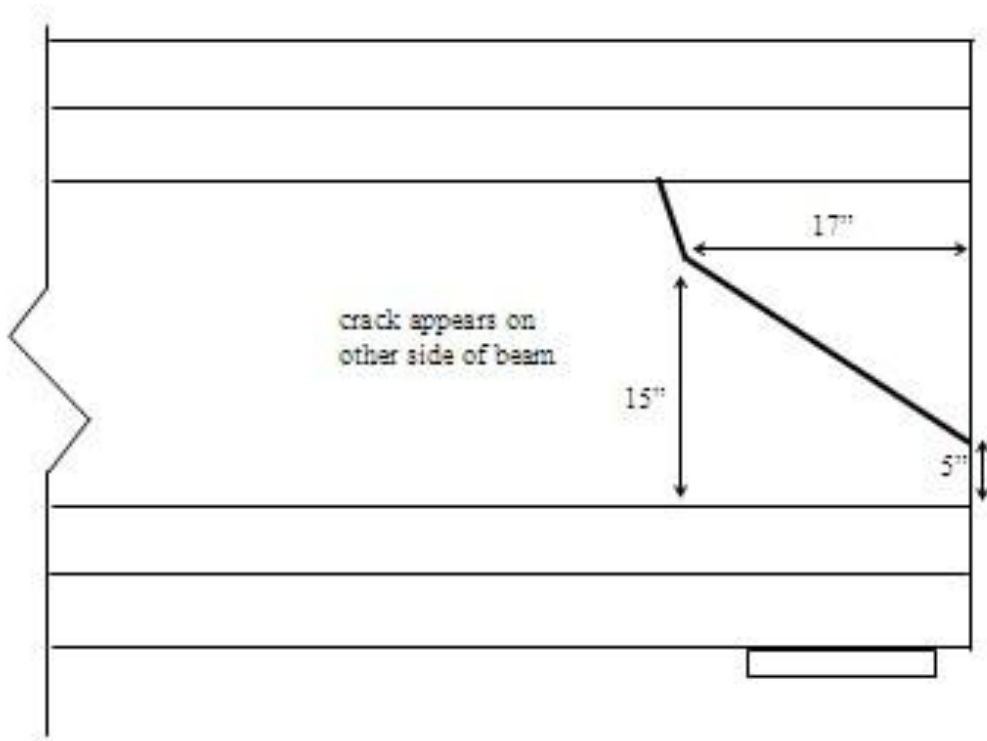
Crack diagram for south span girder, 4th beam from east side, west face, south abutment (#7933).
